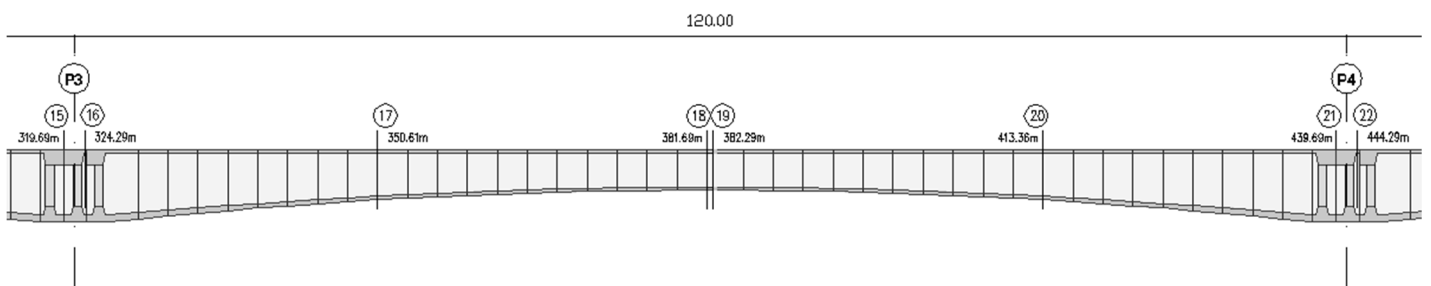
Longitudinal section of Tabellout Viaduct Typical span / Sezione longitudinale della campata tipica del viadotto di Tabellout
